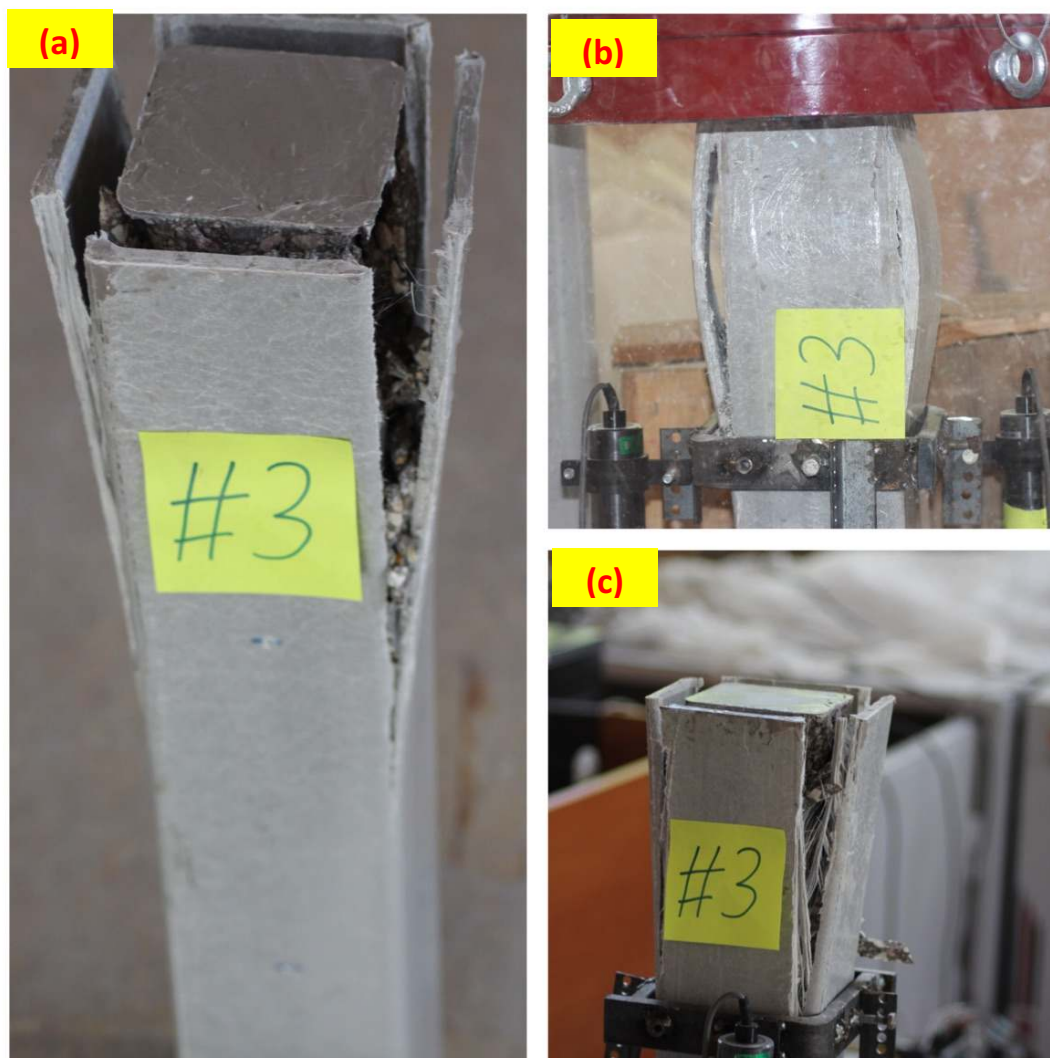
(a&c) failure of tube and concrete, b-Tube separation prior to concrete
